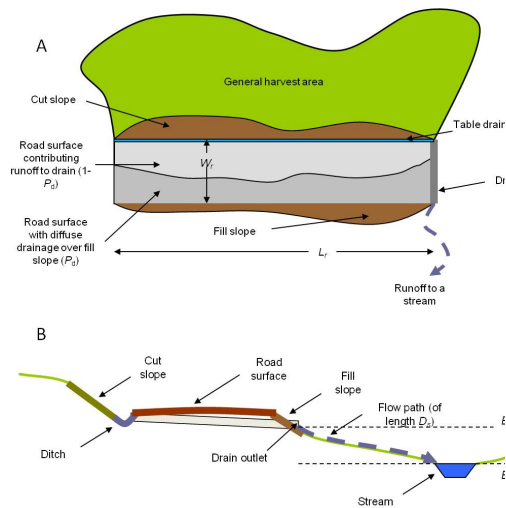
Road attributes in A) planview showing the variable contributing road width ($1-P_d$), the table drain which conveys road runoff to a culvert pipe (drain) which discharges runoff to the hillslope. B) Cross section showing typical crowned road which partitions road runoff sending approximately 50% to the table drain/ditch and 50% over the edge of the fill batter/slope.
